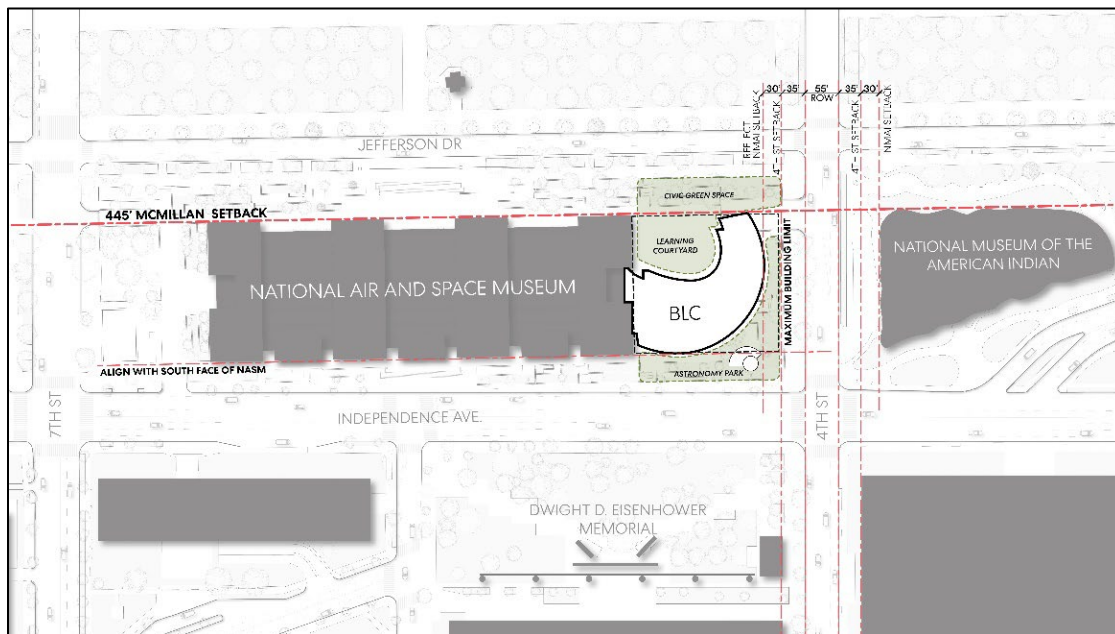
BLC setbacks from L'Enfant Plan streets, protecting viewsheds. (Perkins&Will, 2023)
